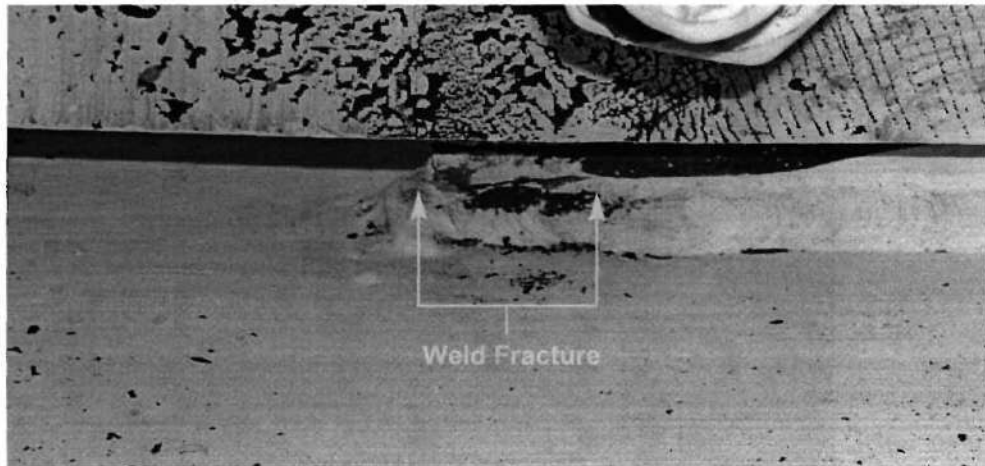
One inch Fracture in Shear Tab Weld
